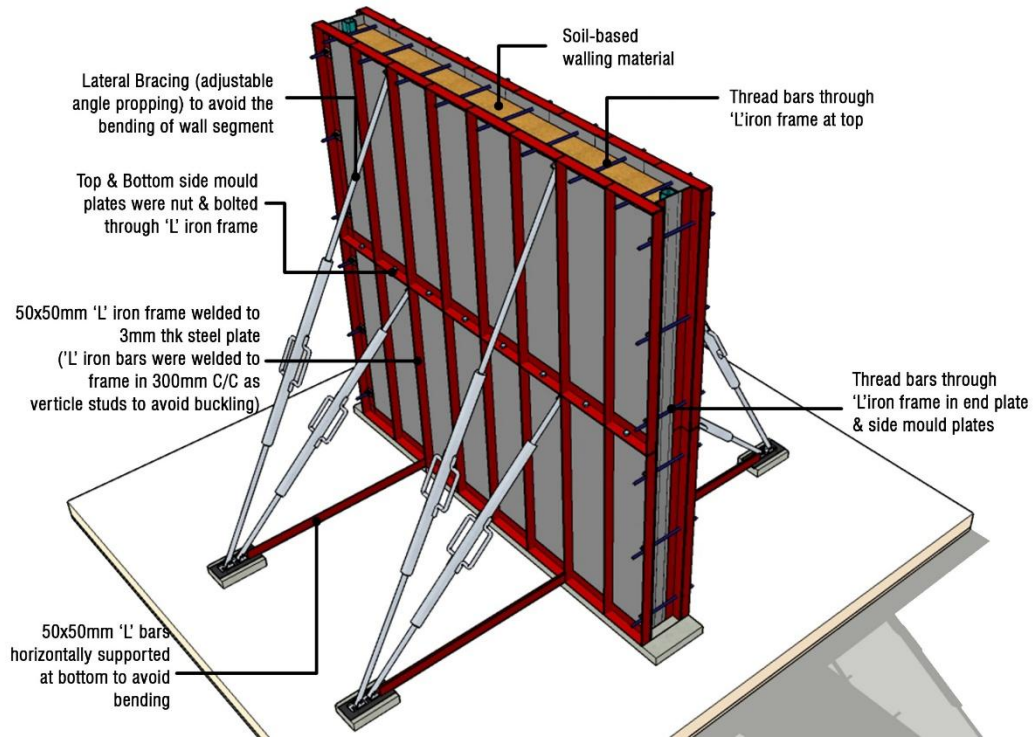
Formwork arrangement to typical wall segment - Step: 02
